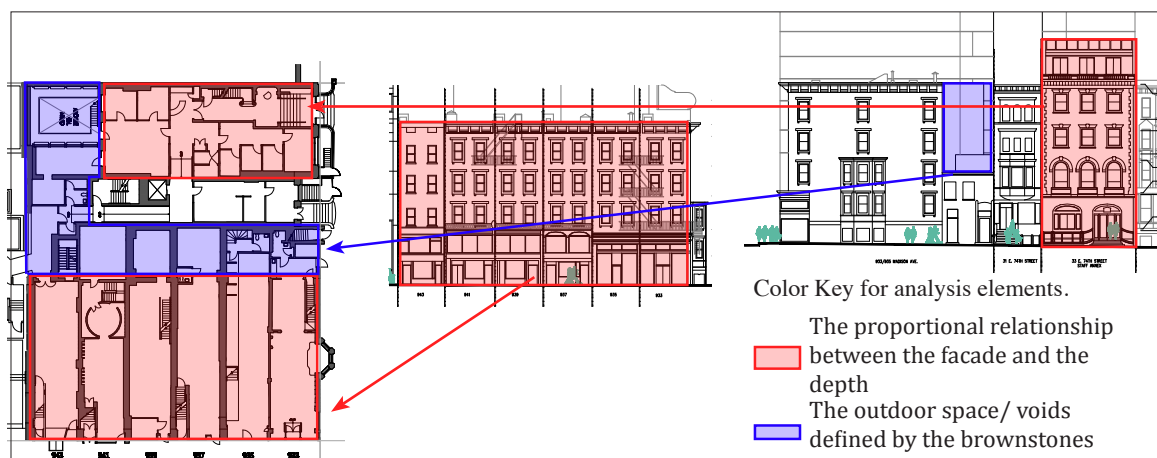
Plan to Elevation: these diagrams illustrate the proportional relationship between the floor plan and the elevation of the brownstones.
